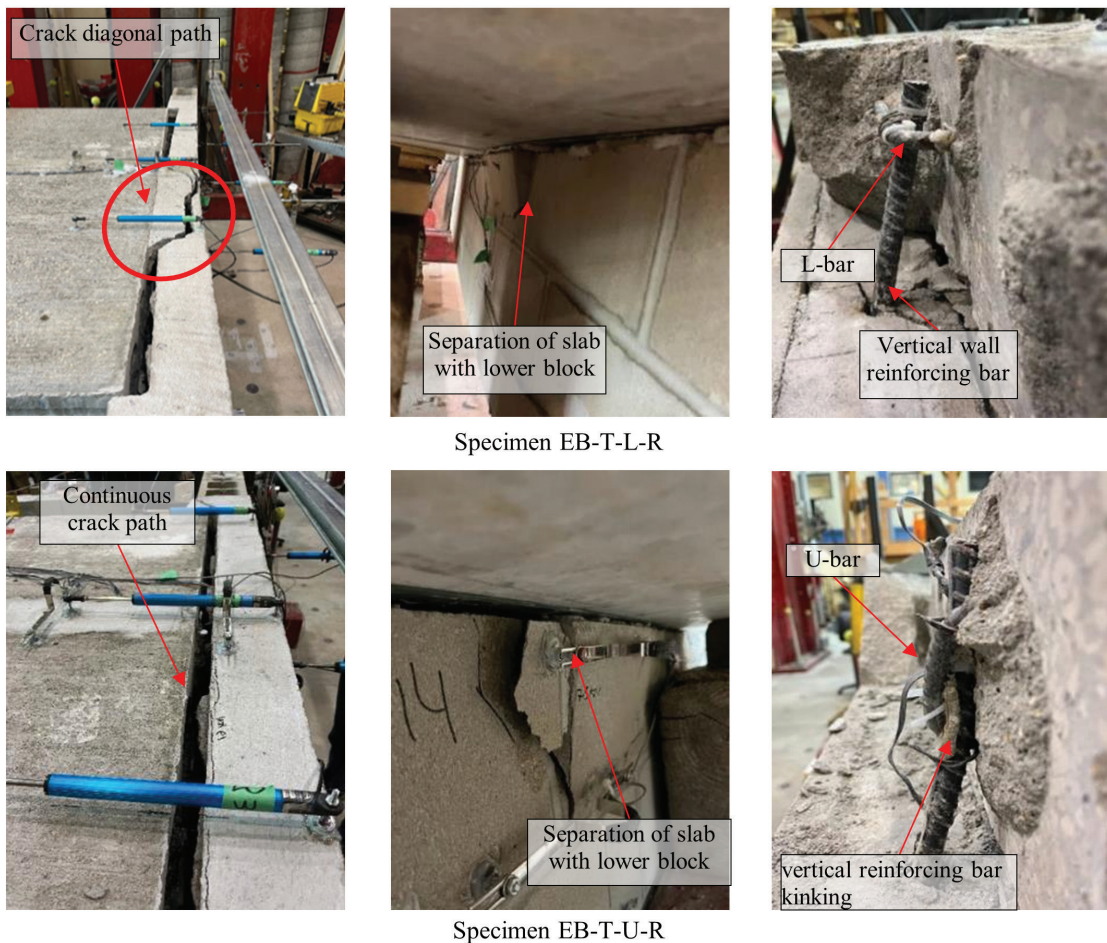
Test specimens at failure. Note: EB-T-L-R = end bearing configuration with tensile loading and an L-shaped bar connection at the roof level; EB-T-U-R = end bearing configuration with tensile loading and a U-shaped bar connection at the roof level.
